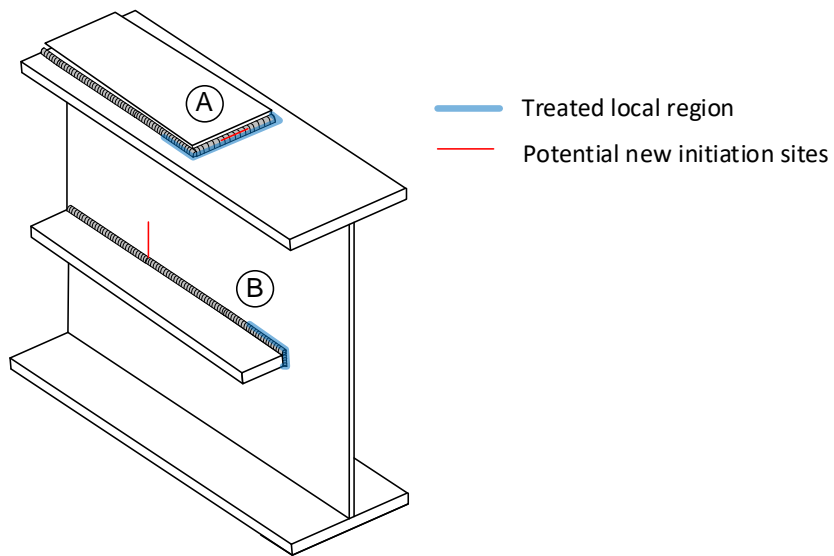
Other cracking modes/locations might need to be checked when HFMI-treatment is applied to extend the fatigue life of existing welded details with respect to toe cracking.
